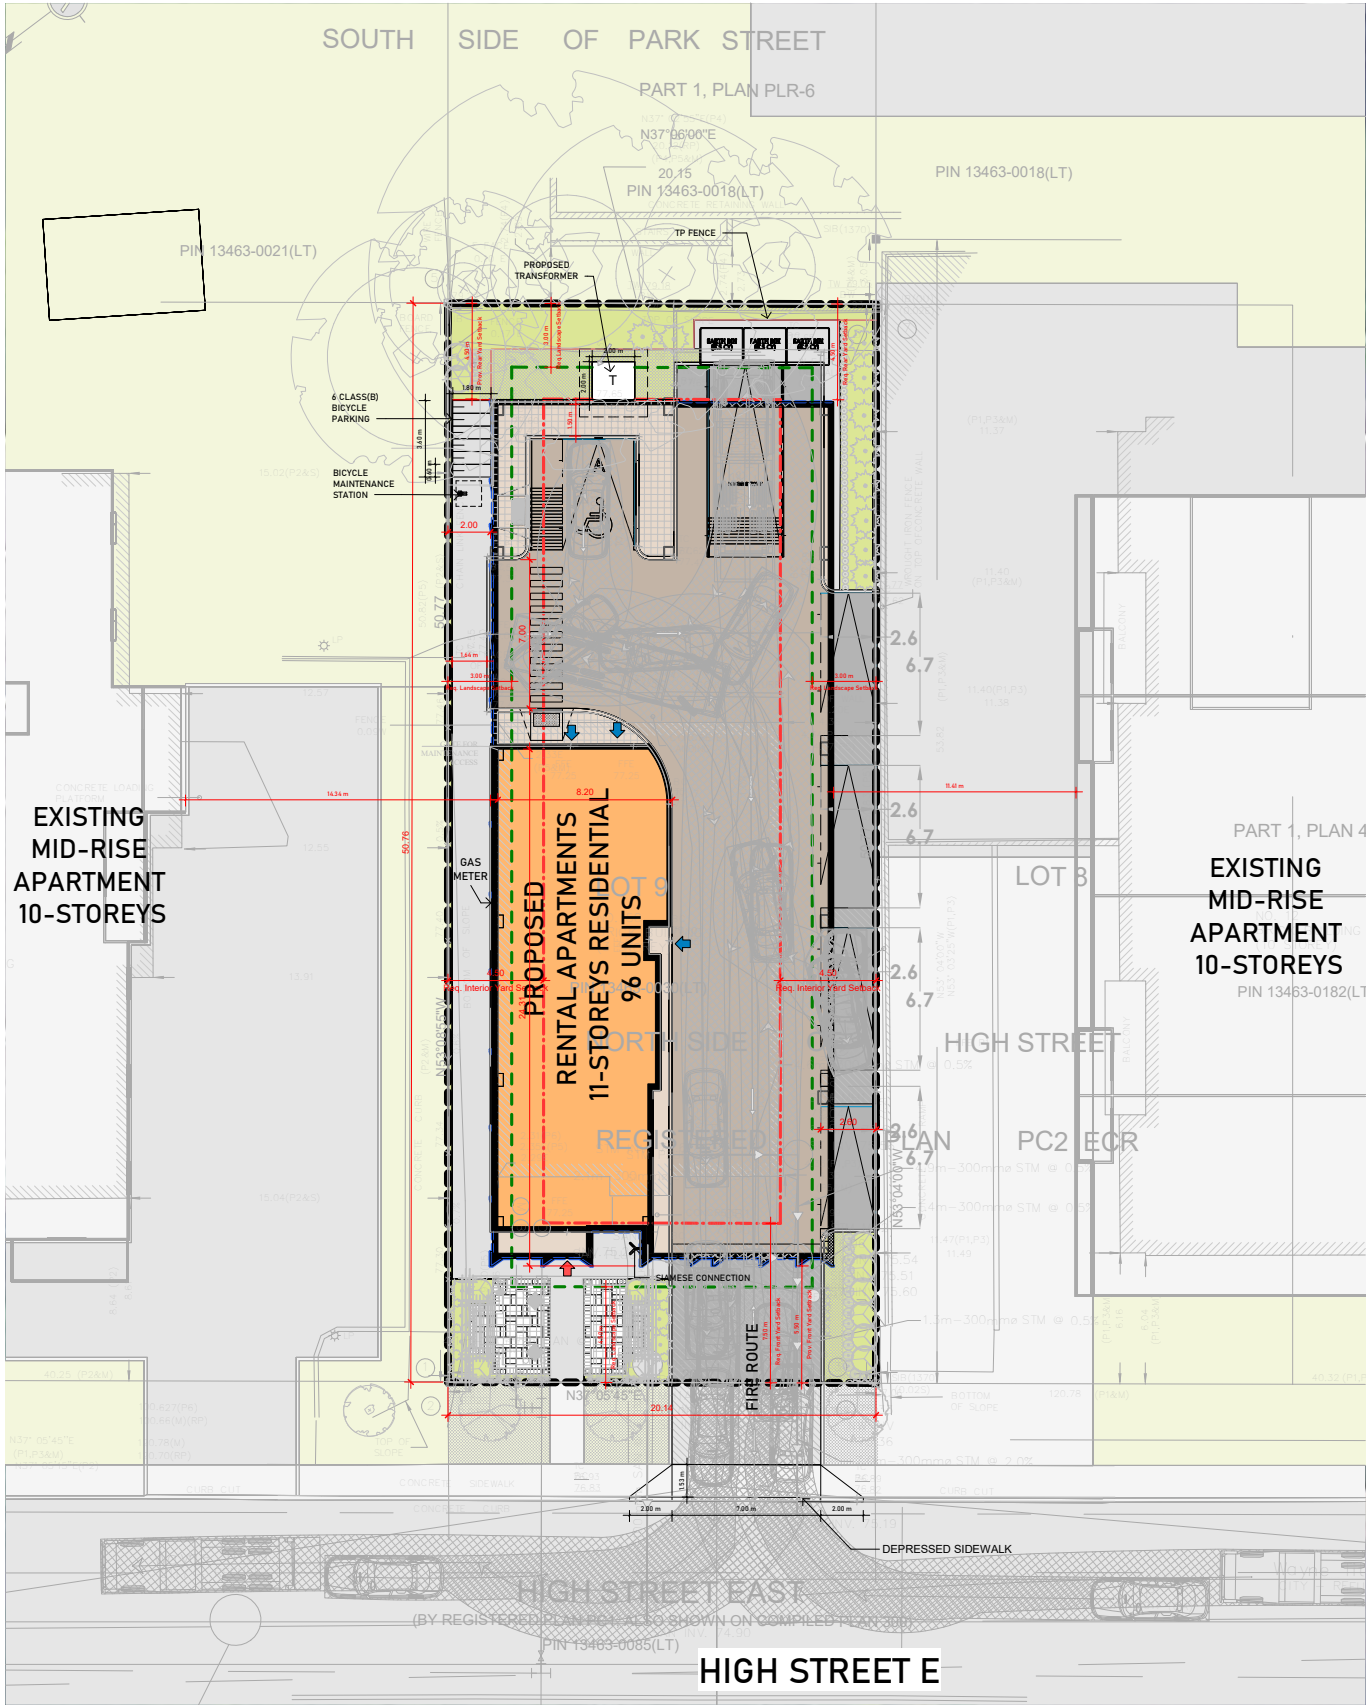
Proposed Site Plan (Source: Chamberlain Architects)
